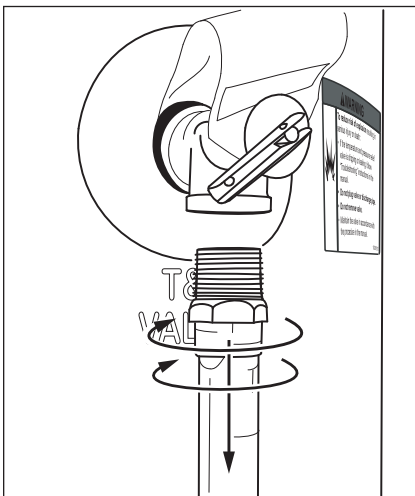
Removing the T&P Relief Valve discharge pipe.
